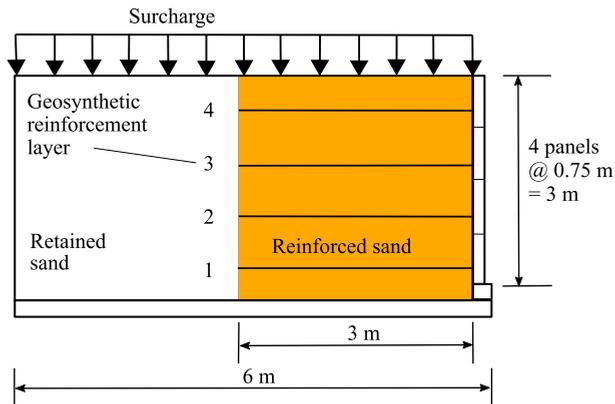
The geometry of GRS walls constructed at RMCC [3].
